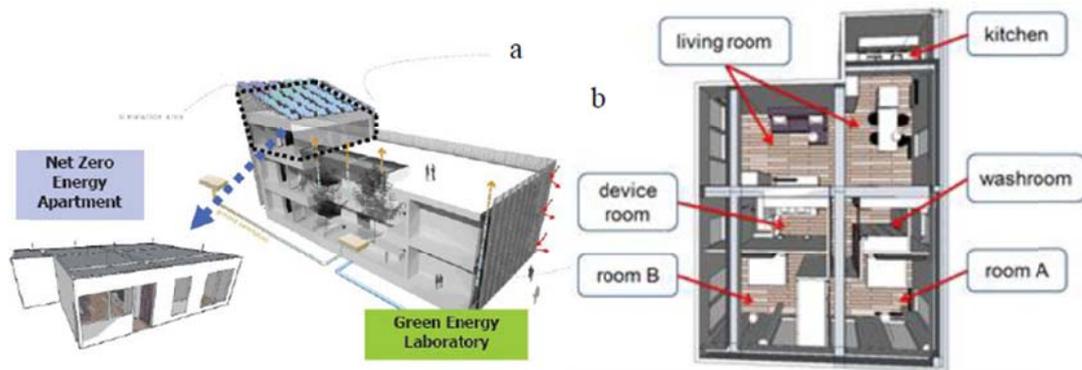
Architectural design: (a) ZEA; (b) inside structure
